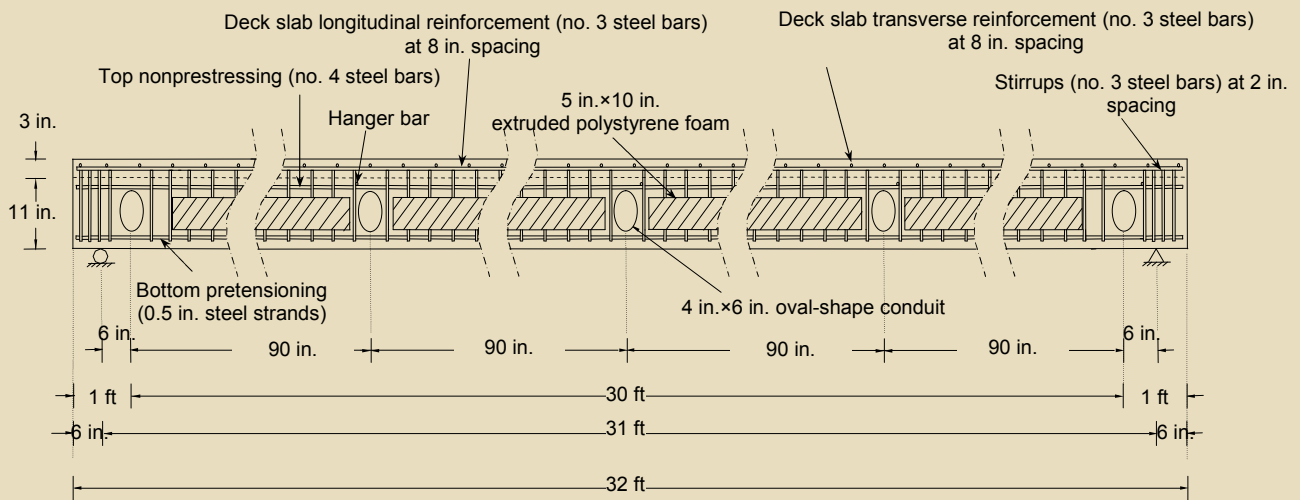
Longitudinal cross-sectional details of conventional bridge model. Note: no. 3 = 10M; no. 4 = 13M; 1 in. = 25.4 mm; 1 ft = 0.305 m.
